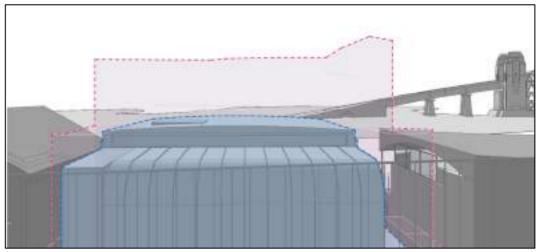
Proposed view from terrace of No 17 Waiwera Street
